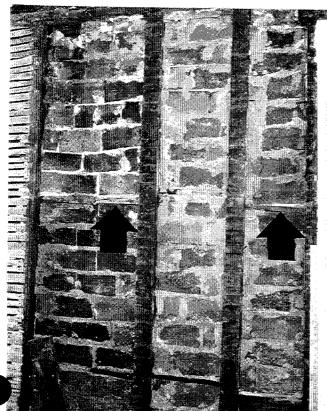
TOP OF STUD FRAMING AT EXISTING 1851 COT-TAGE WALL
